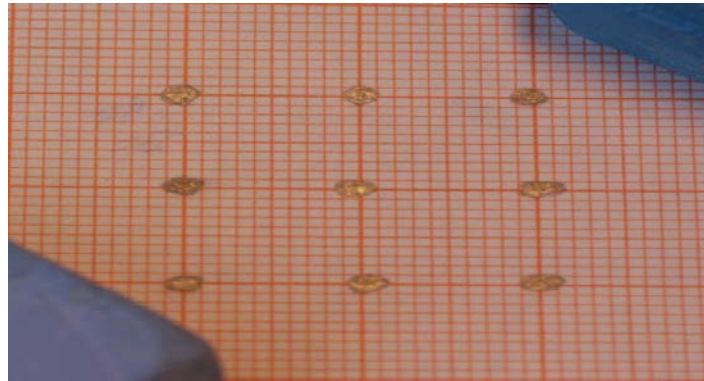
Arrangement to take photos to the pieces of shear crack surface (1)
